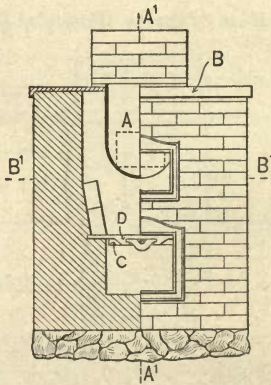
End Elevation of Brick Work for Setting Single Kettle.
